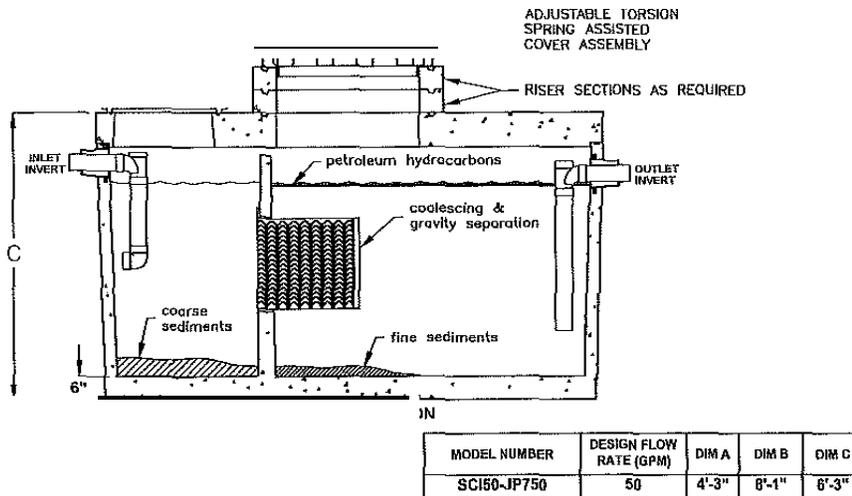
Jensen Precast OWS installed at some ADOT vehicle wash facilities²
